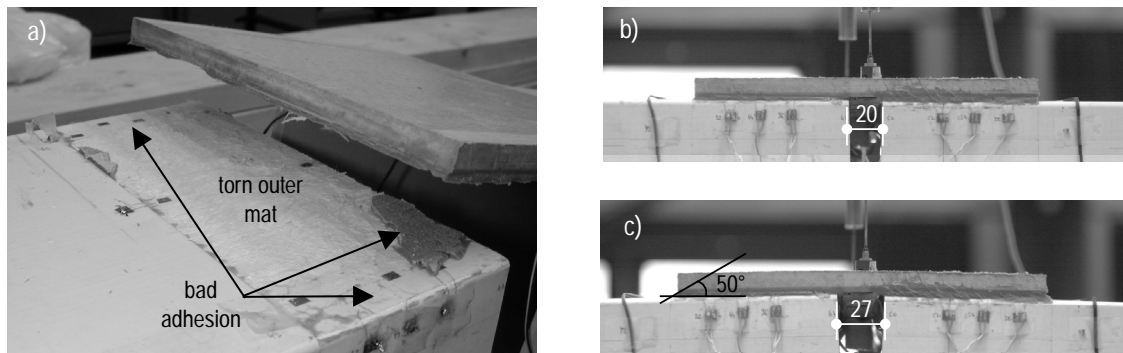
(a) First failure of bonded beam PH3 at mid-support (strain gages staggered in the 100 mm overlap); Widening of upper part of bonded joint of beam PH3 (b) initial position, (c) deformation at 118 kN
